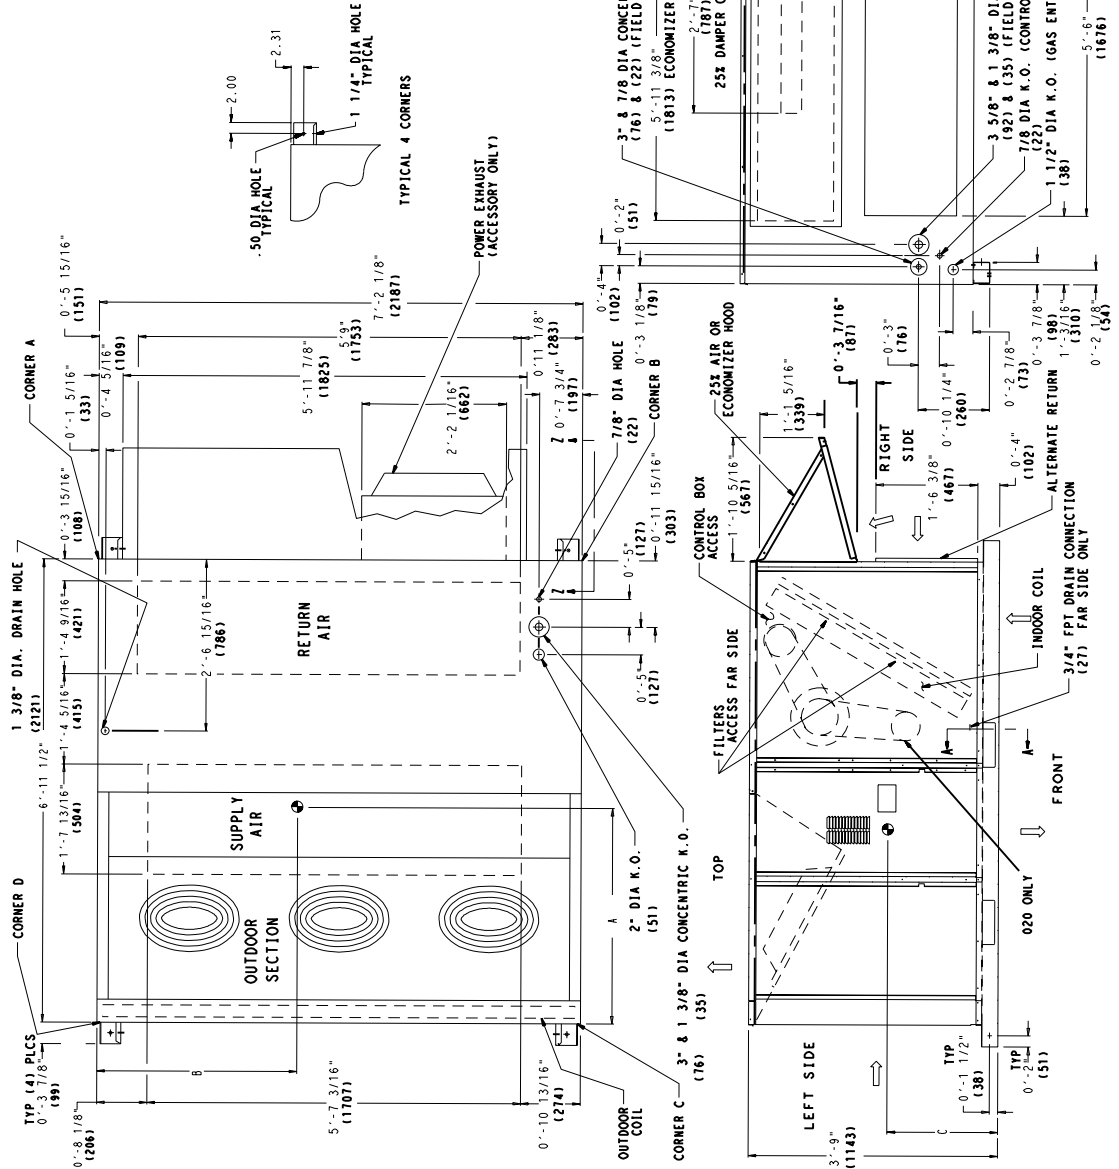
Base Unit Dimensions; 48TJ016,020
